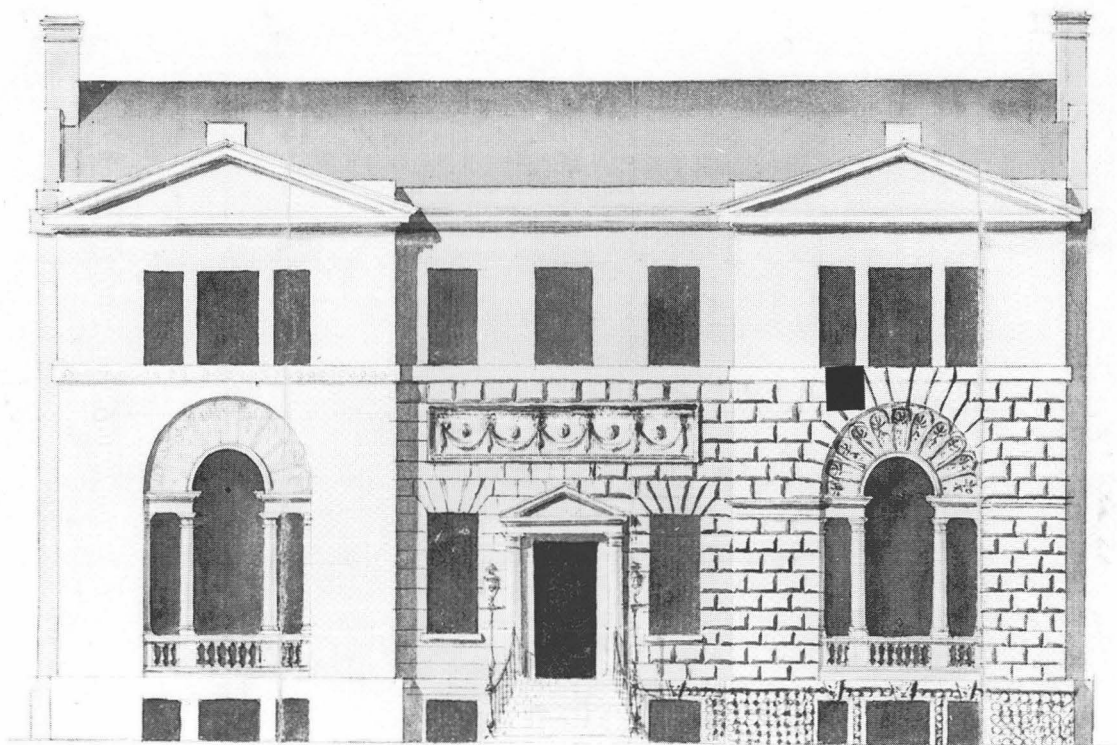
Robert Adam, elevation of Marlborough House, 1786, pen. (Source: Sir John Soane's Museum.)
